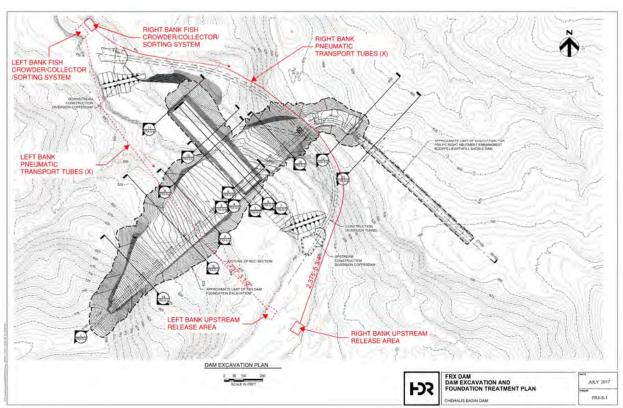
Pneumatic Fish Transport Tube System (Whooshh) Schematic with Flood Retention Structure Excavation and Foundation Plan
